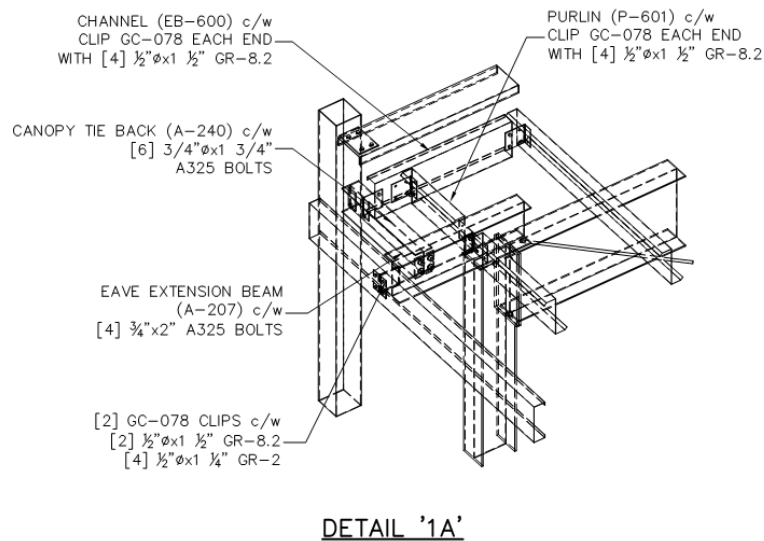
Example of ISO view from 3D model added to 2D erection drawings
